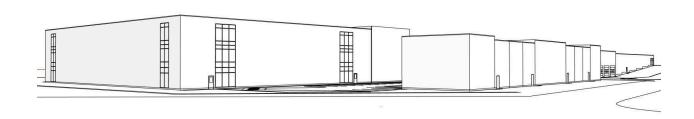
View 2 - Building B and D approach from Dairy Drive (south-west corner).
